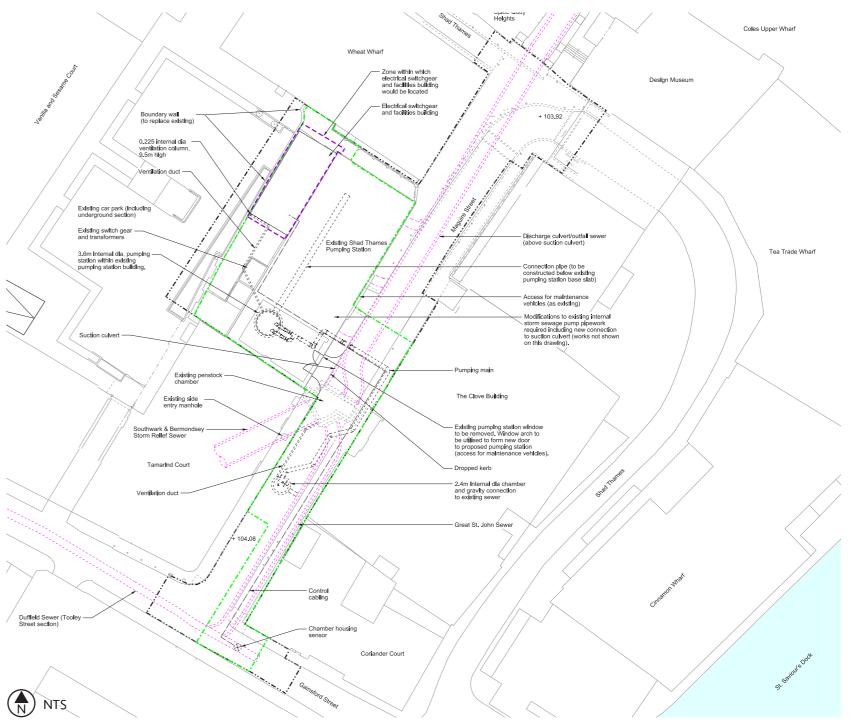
Permanent works layout - refer to Permanent works layout in the Book of Plans
